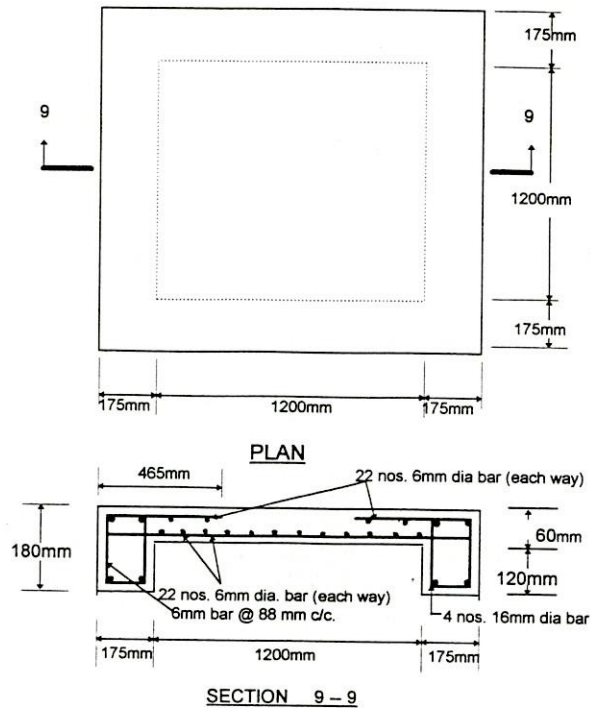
(a) Plan (b) Section and reinforcement details of SLAB9
